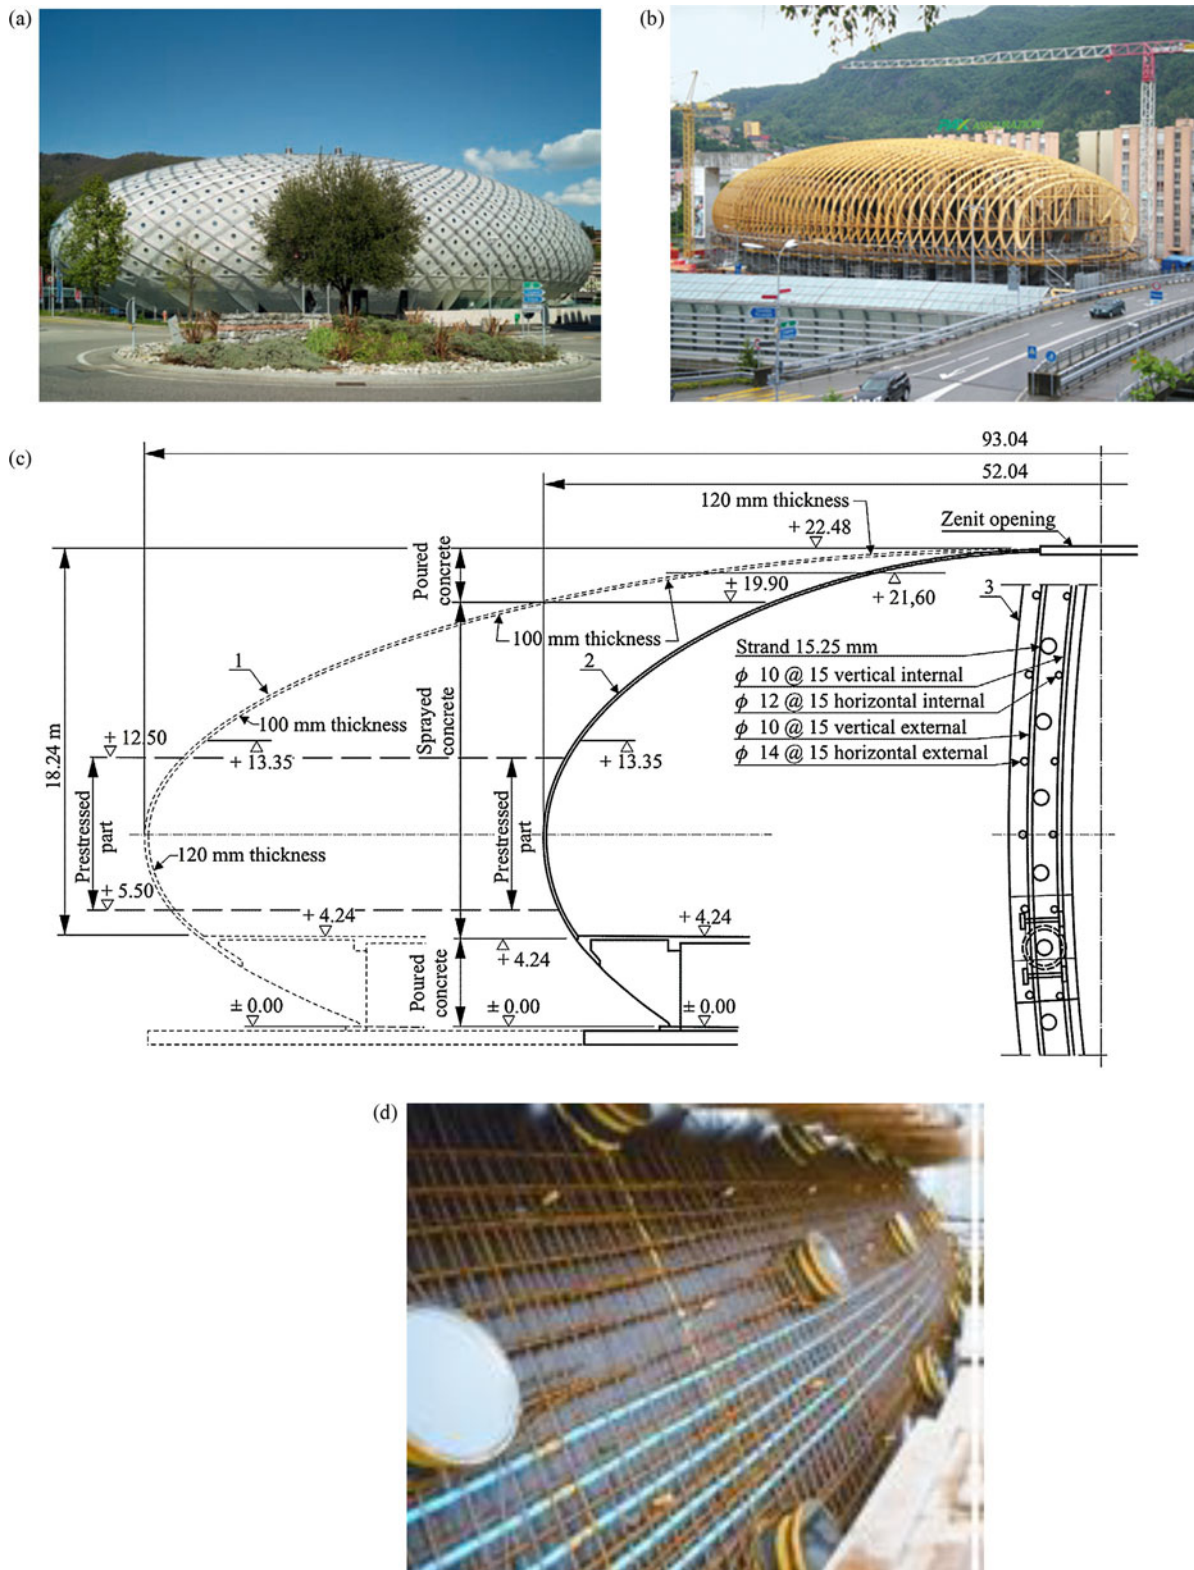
Centro Ovale Shopping Centre in Chiasso [12]: (a) general view, (b) temporary falsework photo: Aurelio Muttoni, (c) shell sections: 1 – longitudinal section, 2 – cross section, 3 – reinforcement in the equator region with prestressing tendons and transverse reinforcement equal to 0.5% of the concrete surface, (d) view of prestressing tendons at the level from +5.50 to +12.50 m.
